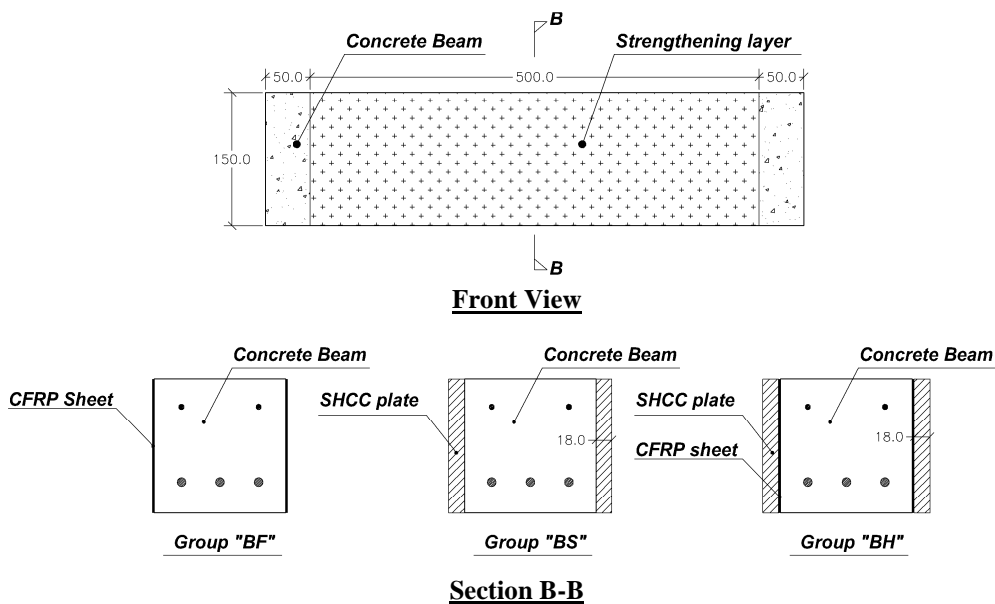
Details of the strengthening techniques applied to the beams of type "B"
